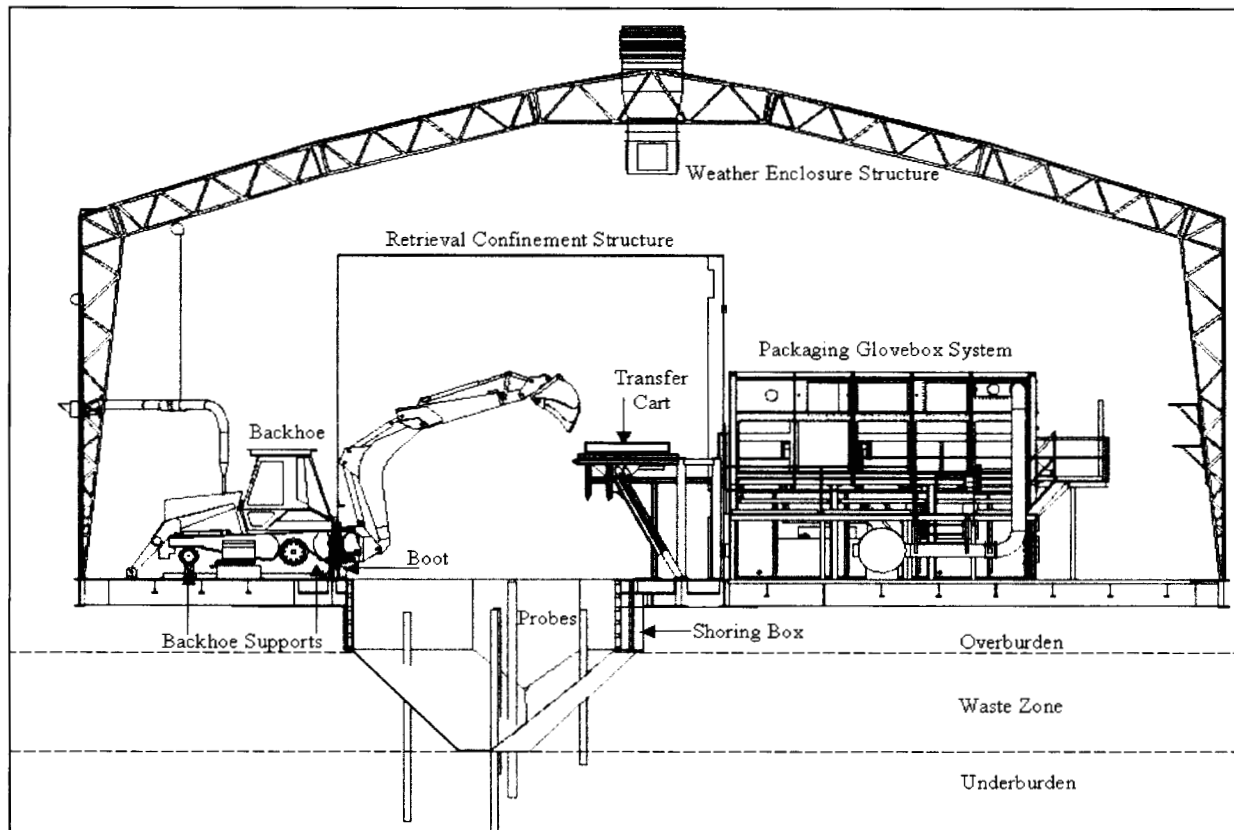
Cross section of the Glovebox Excavator Method Project facility.
